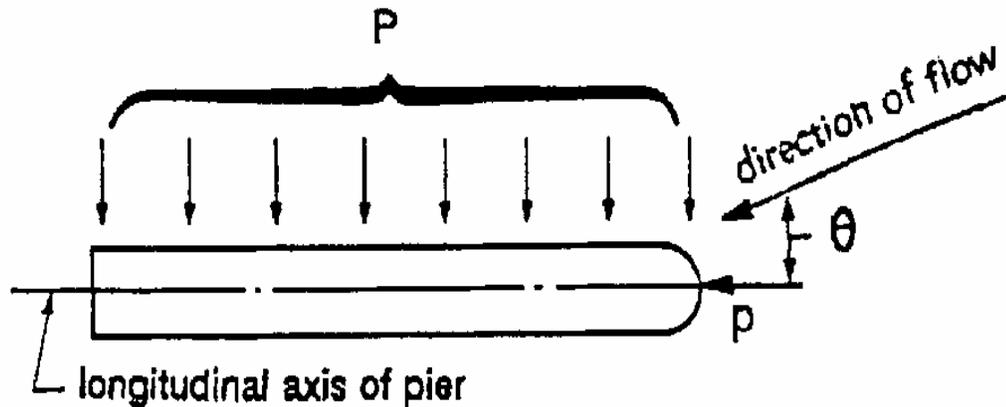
Plan View of Pier Showing Stream Flow Pressure (AASHTO 3.7.3.2-1)
